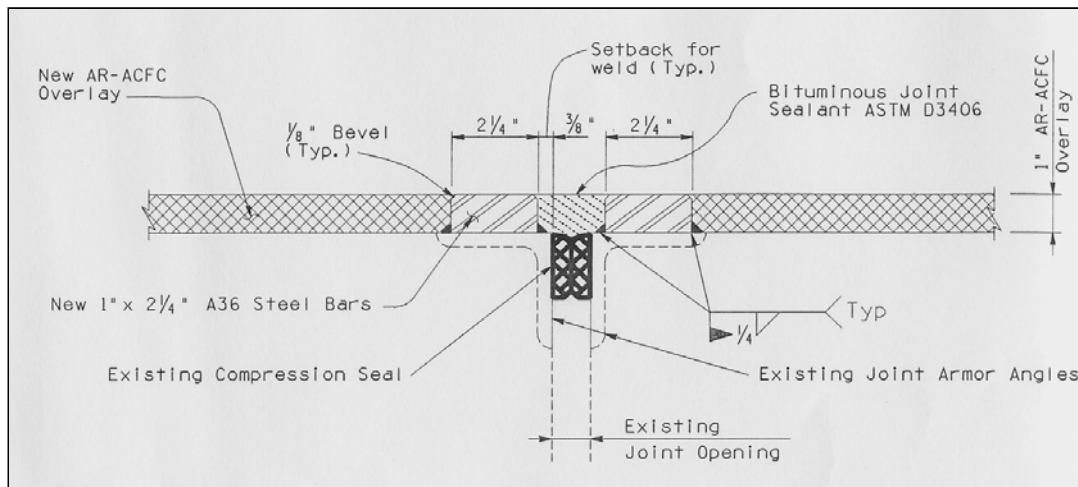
Proposed ADOT detail for AR-ACRC overlay of bridge deck joint
